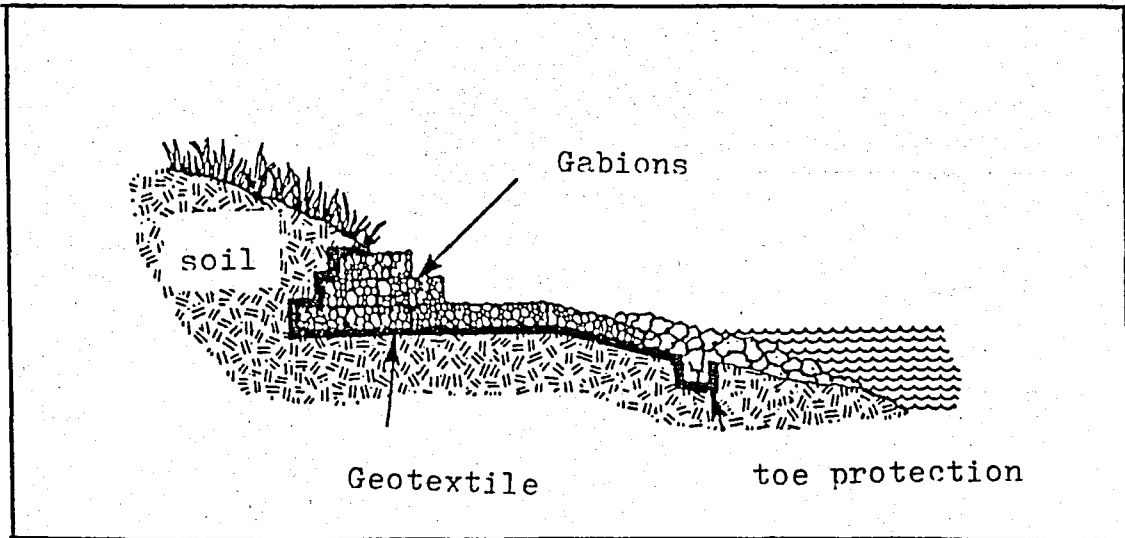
USE OF GEOTEXTILE IN GABION REVETMENT
